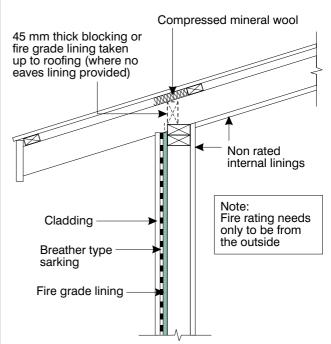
FIRE GRADE LINING OR BLOCKING CONTINUED UP TO ROOF
